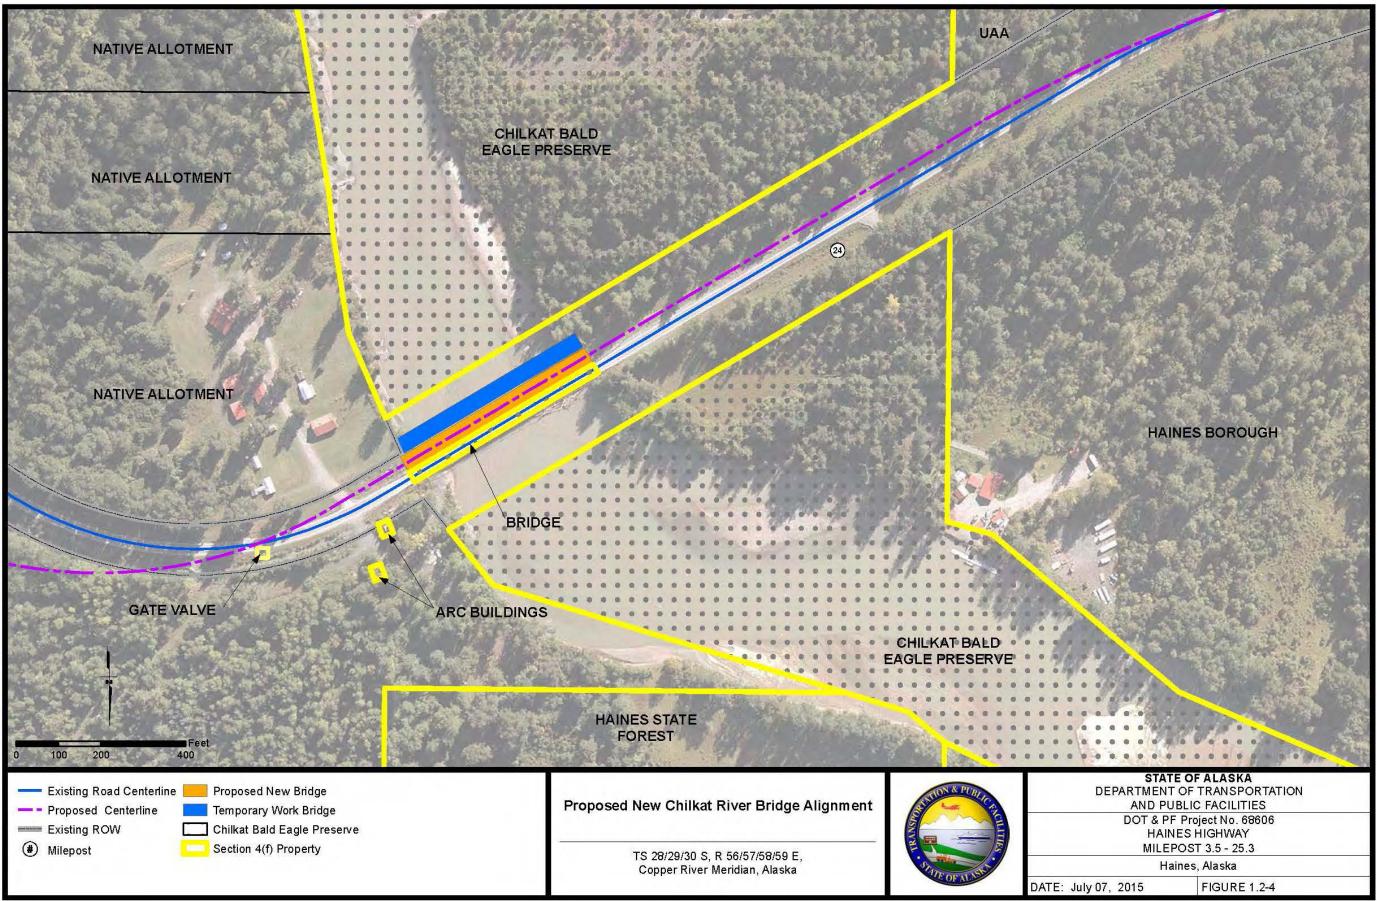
Proposed New Chilkat River Bridge Alignment
